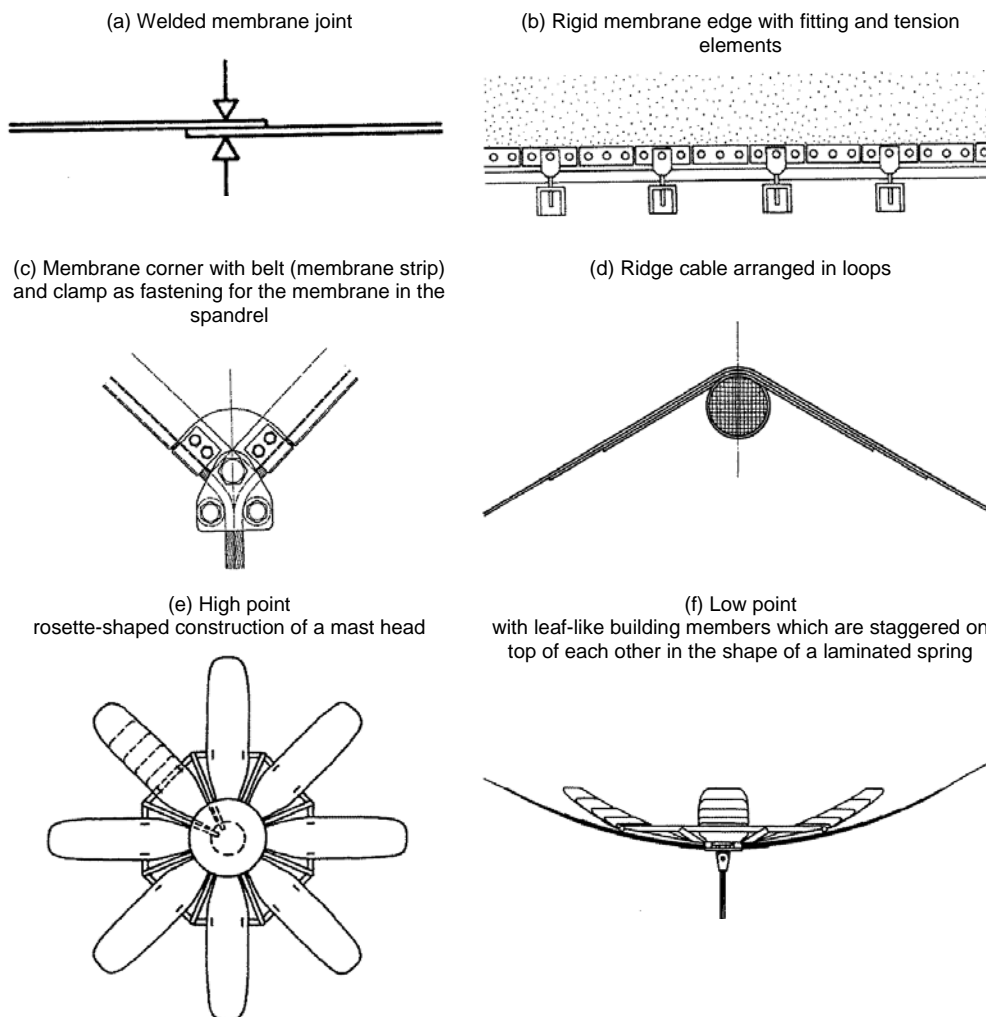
Typical exemplary details and connections in membrane structures [Bub97]
